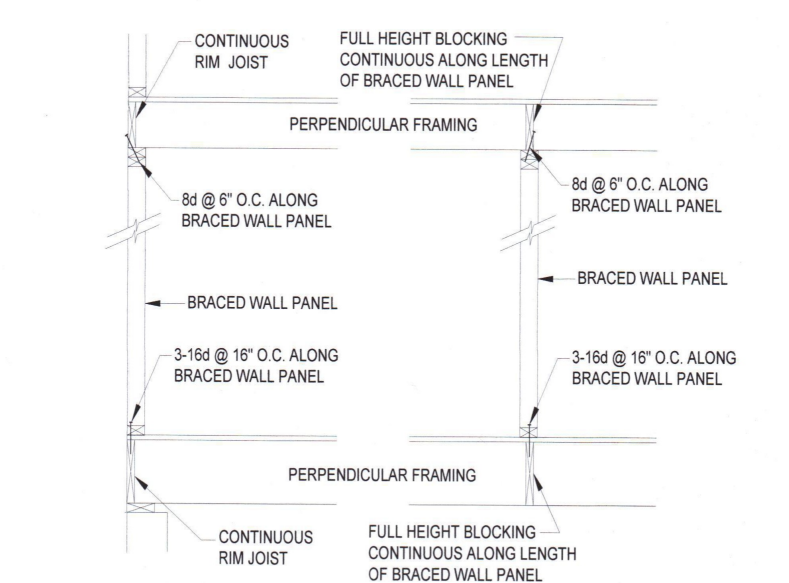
BRACED WALL PANEL CONNECTION WHEN PERPENDICULAR TO FLOOR/CEILING FRAMING
